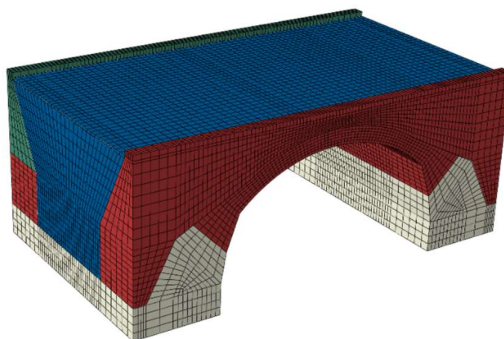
Computational FEM domain, Fabryczna street bridge: red – masonry walls, green – concrete spandrel wall, blue – backfill, white – foundations and abutments.
